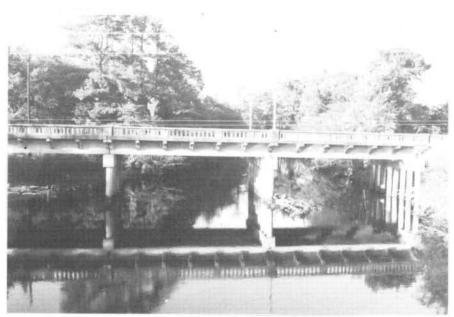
N. C. 41 HIGHWAY BRIDGE (R.M. 63.4)
